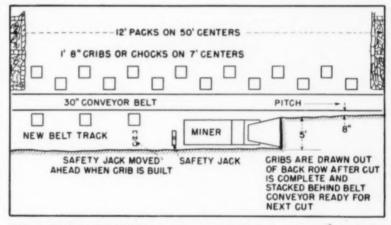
TWO-WAY MINING permits support behind the miner by chocks installed as the machine advances. Safety jack is kept at the rear of the machine.
